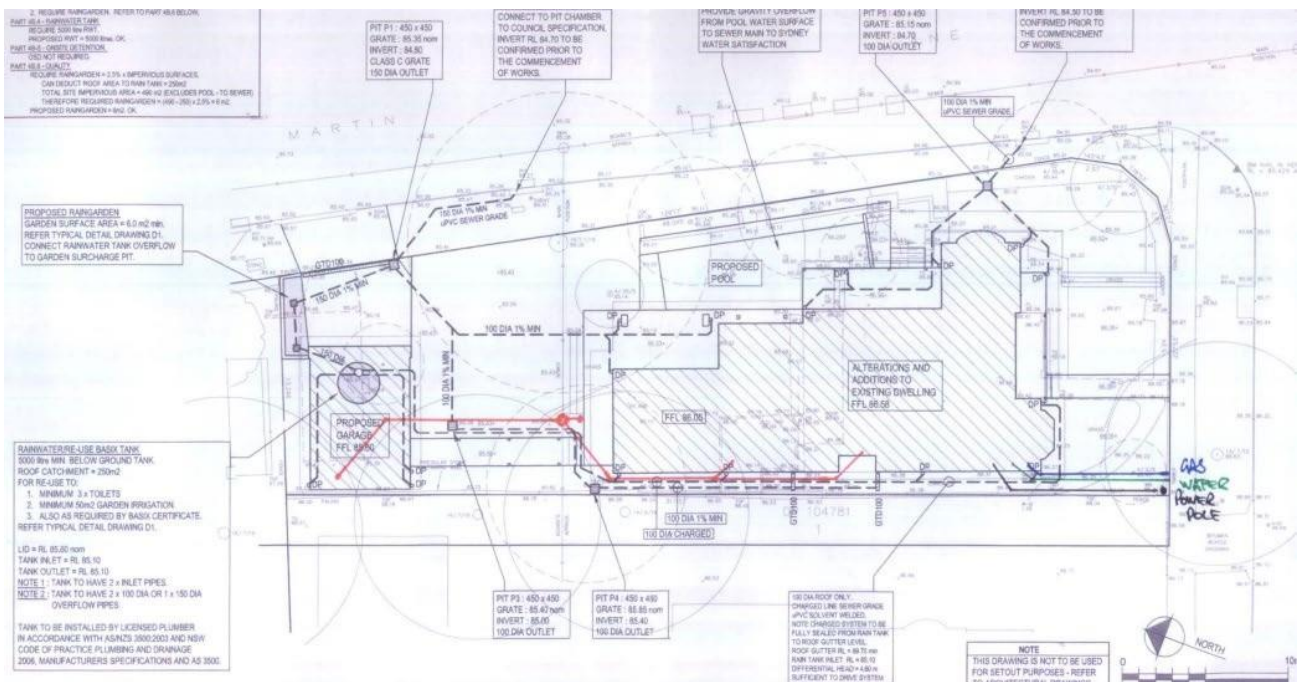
Floor plan for proposed garage, inground swimming pool and alterations to dwelling dated from 2014
